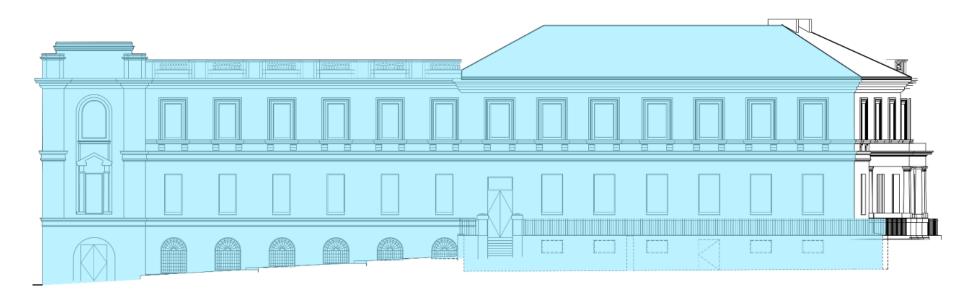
Grading Diagrams – Grading of Building Form and Spaces (Bridge Street Façade)
